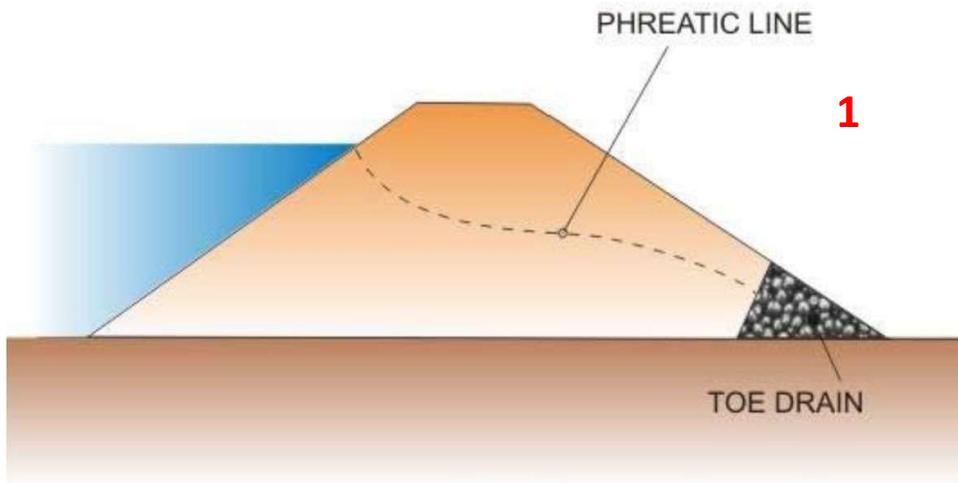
Homogeneous earthen embankment dam with toe drain
